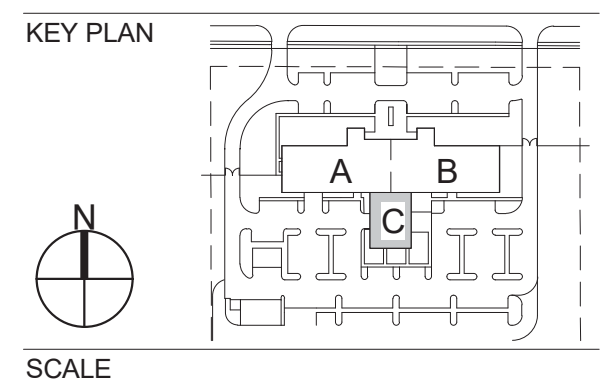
EXHIBIT A AVS & TECHNOLOGY PLANS & DETAILS
